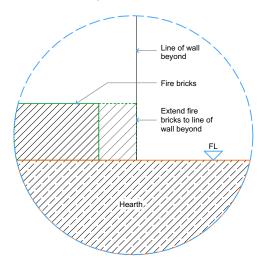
Cross Section Fire Surround Opt. 3 Timber Cavity
